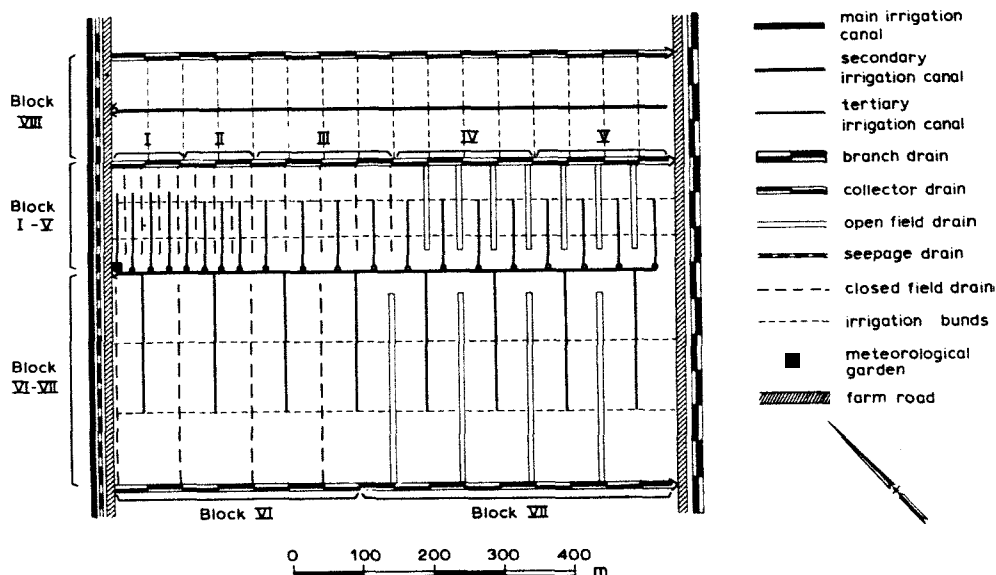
Plan Dujailah drainage and land reclamation farm
